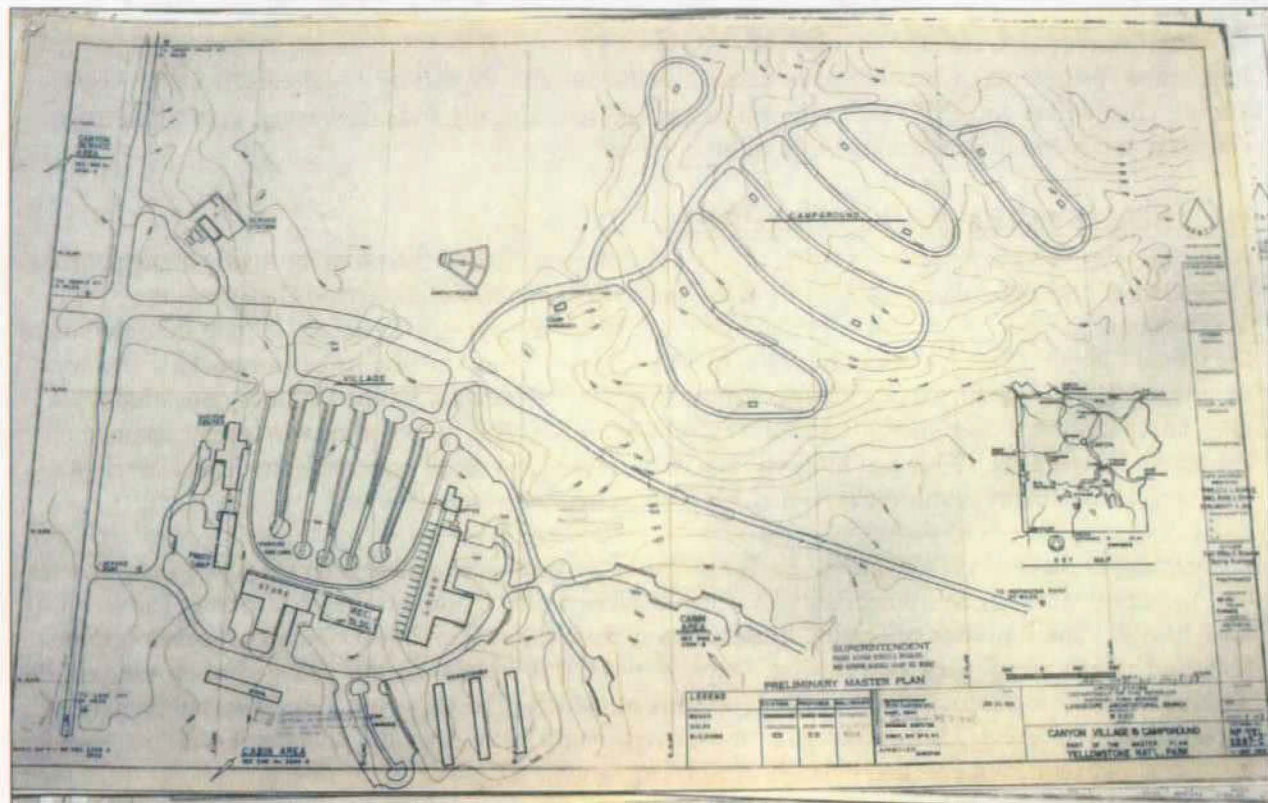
; Photo Image of 1958 Canyon Area Master Plan
